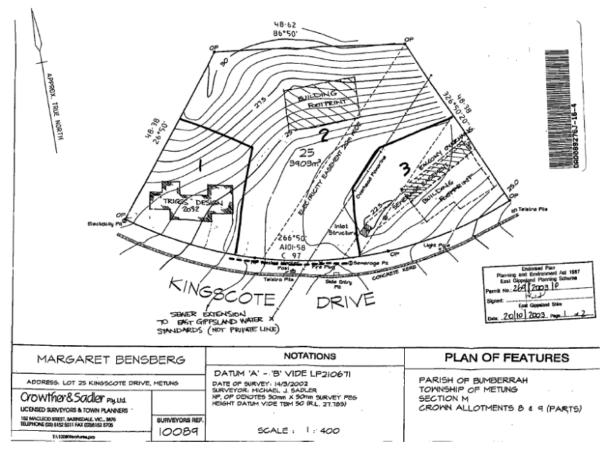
Latest Endorsed Plan, Planning Permit Application 269/2003/P
